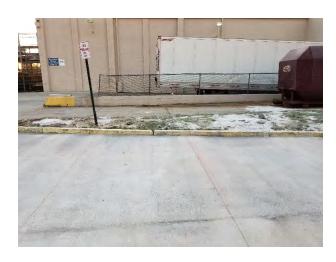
PHOTO LOG - Concrete Slab Replacement Activity - November-December 2018
